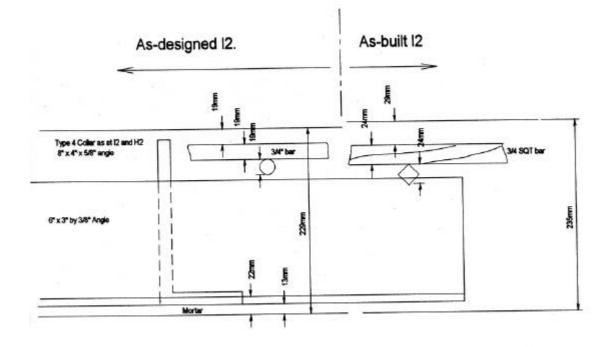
2 As-designed and as-built cover to top reinforcement
